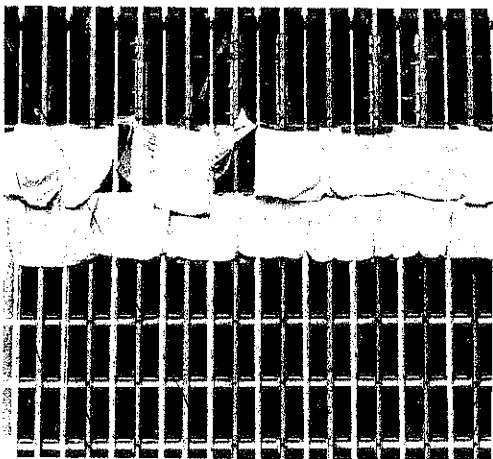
Multistory building inadequately enclosed with canvas. Note openings where tarpaulins have not been secured.
